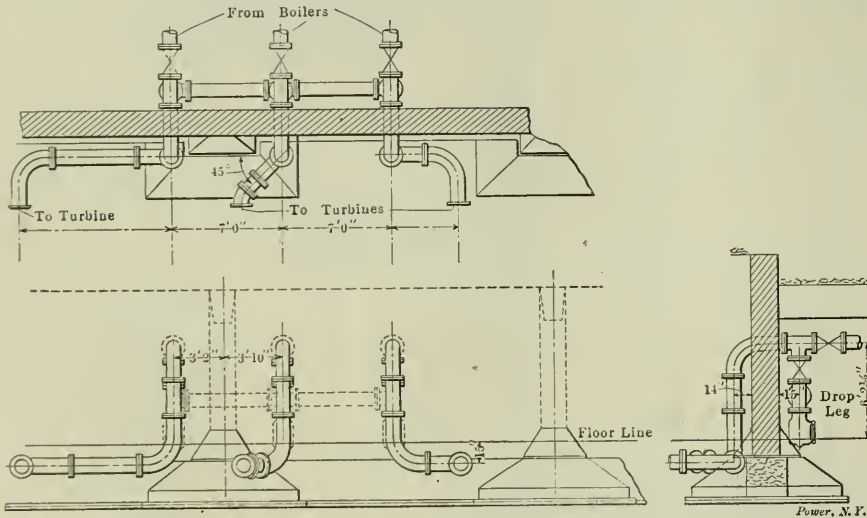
STEAM HEADER MANIFOLD BETWEEN BOILERS AND TURBINES
